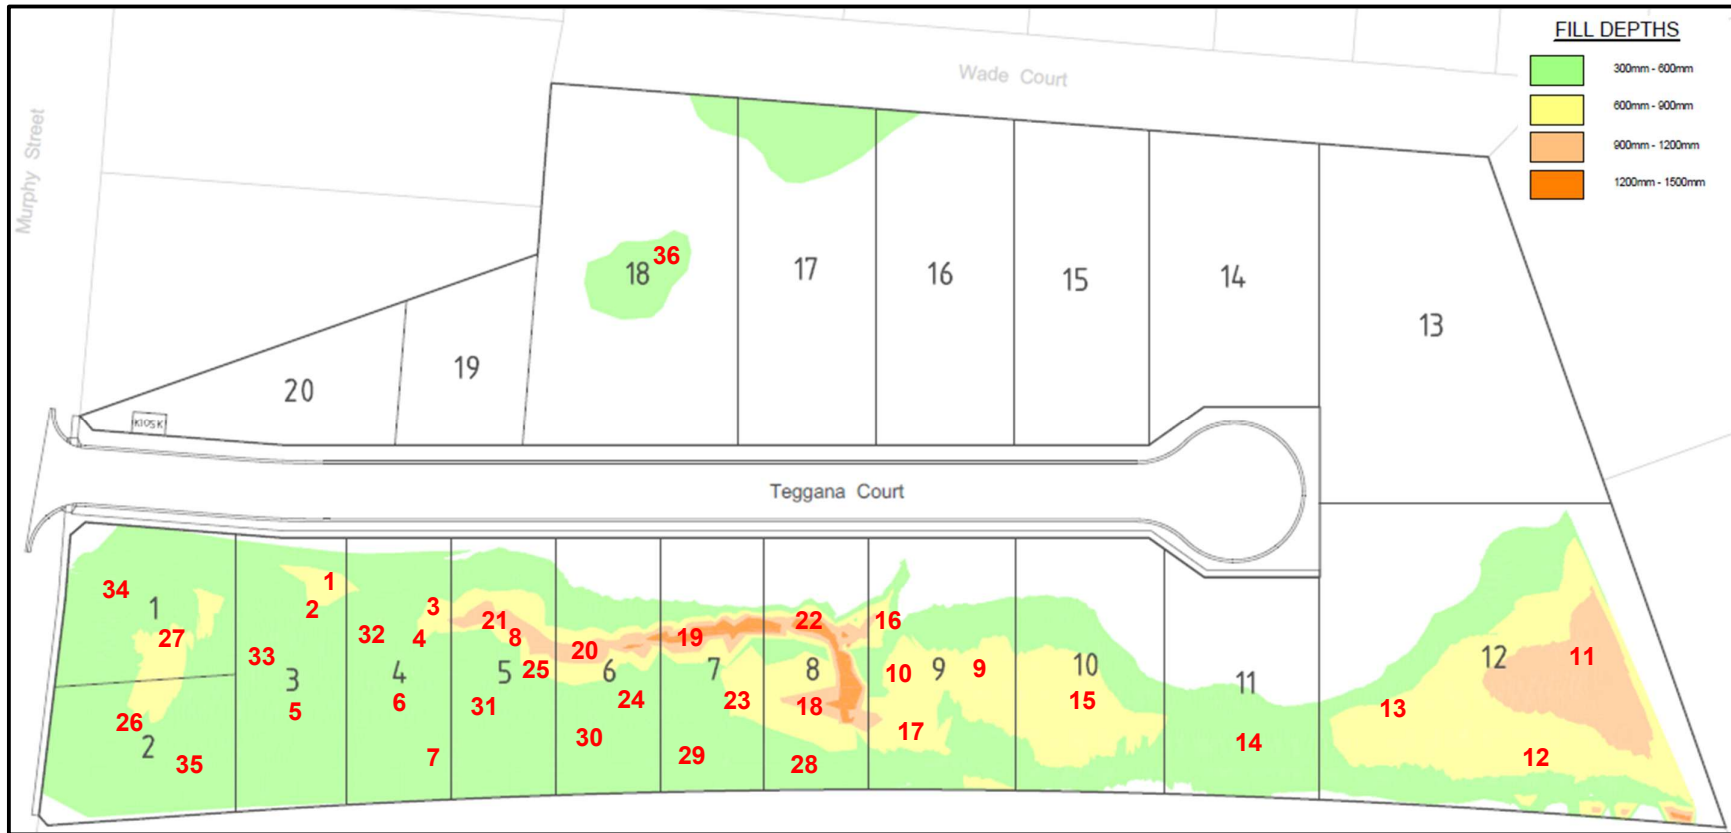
178-182 Murphy Street - Site Plan – Approximate testing locations (red)
